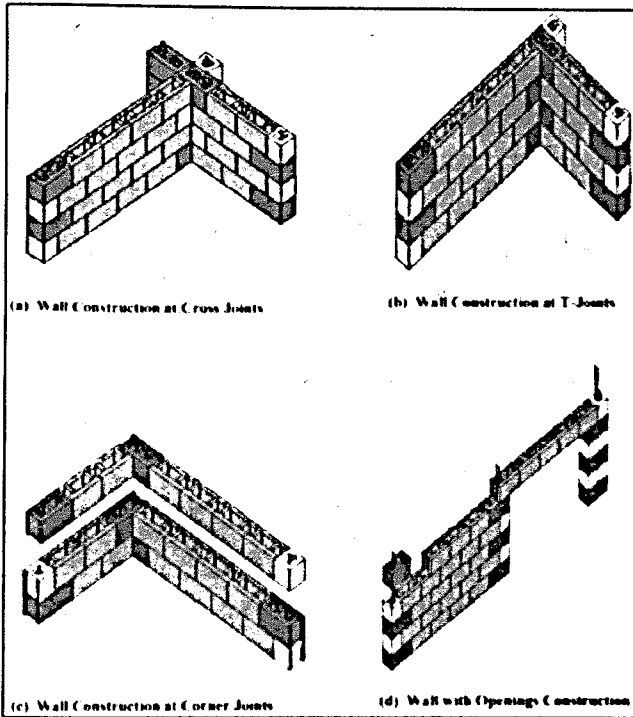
Schematic drawing for corner walls and walls with opening construction.
